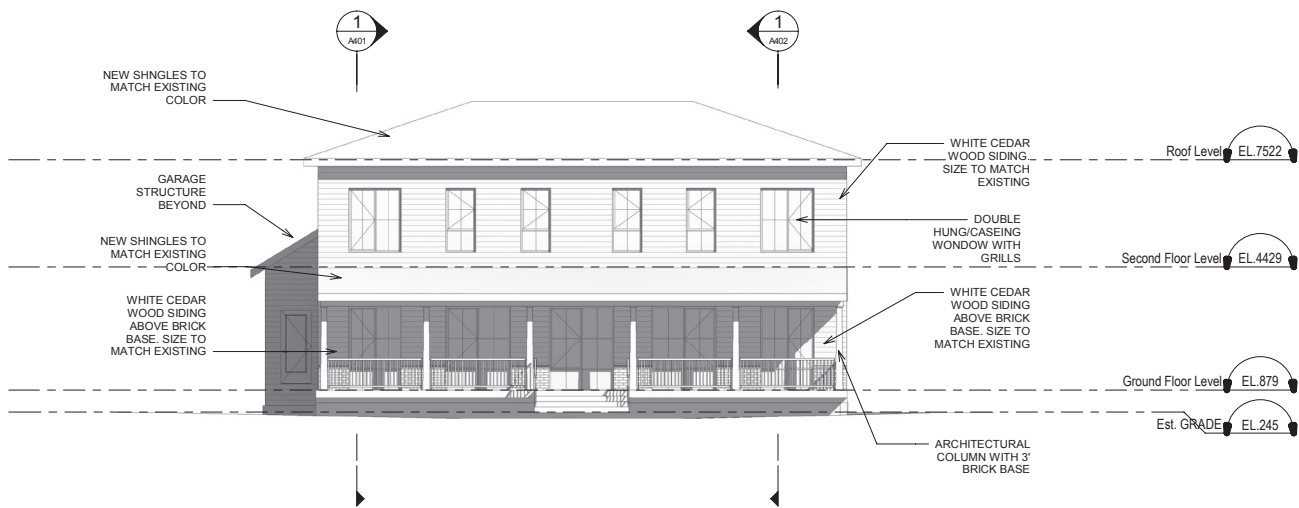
Rear/North Elevation. New Addition at rear. Drawing by Third Layer Architects, 2021.
